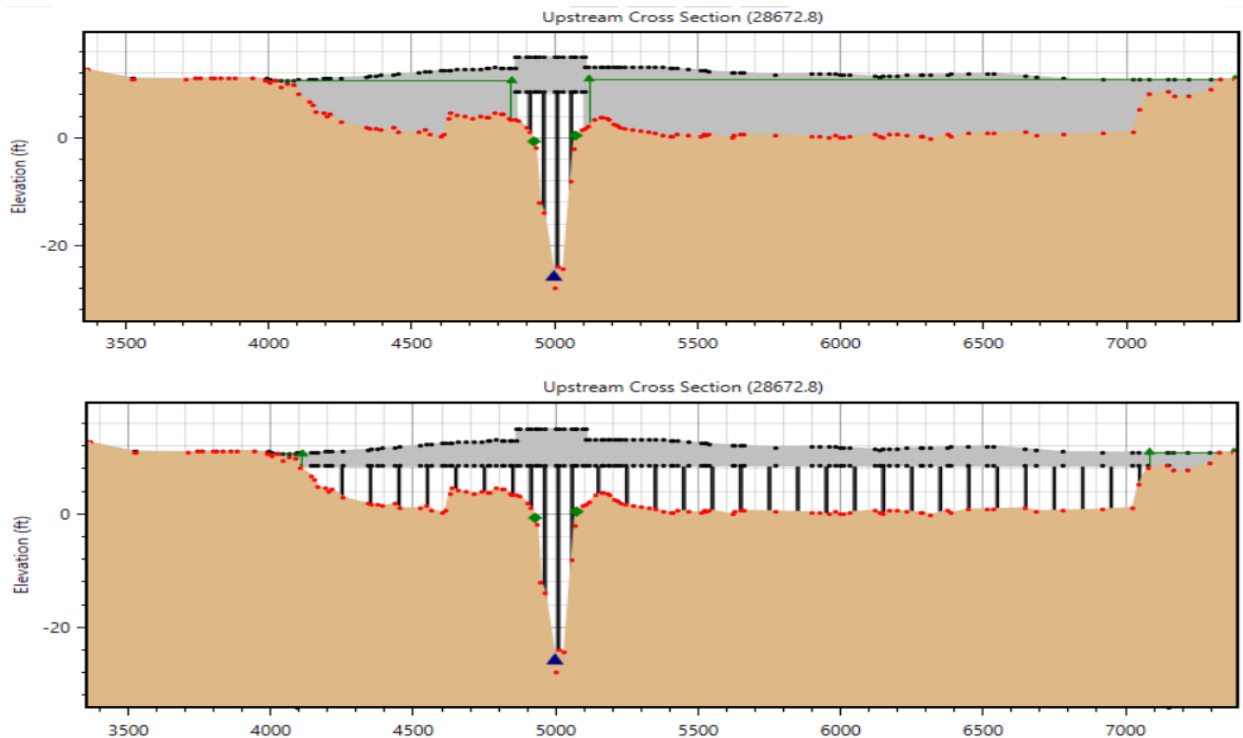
Existing (top) and modified (bottom) cross sections for the NC 43 bridge across Swift Creek. The modified cross section shows the embankment removed, extension of the bridge deck across the floodplain, and additional piers.
